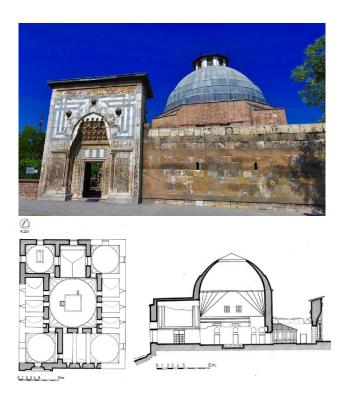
Karatay Madrasa Facade, Plan & Section (Okur Yazarim, 2017a)
